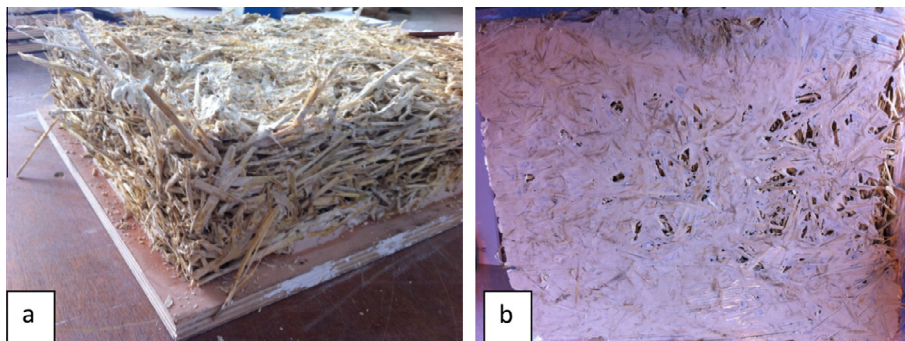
Manufacture of the composite blocks with problems: (a) absence of binder between fibers, (b) Segregation of plaster in the mold bottom.
